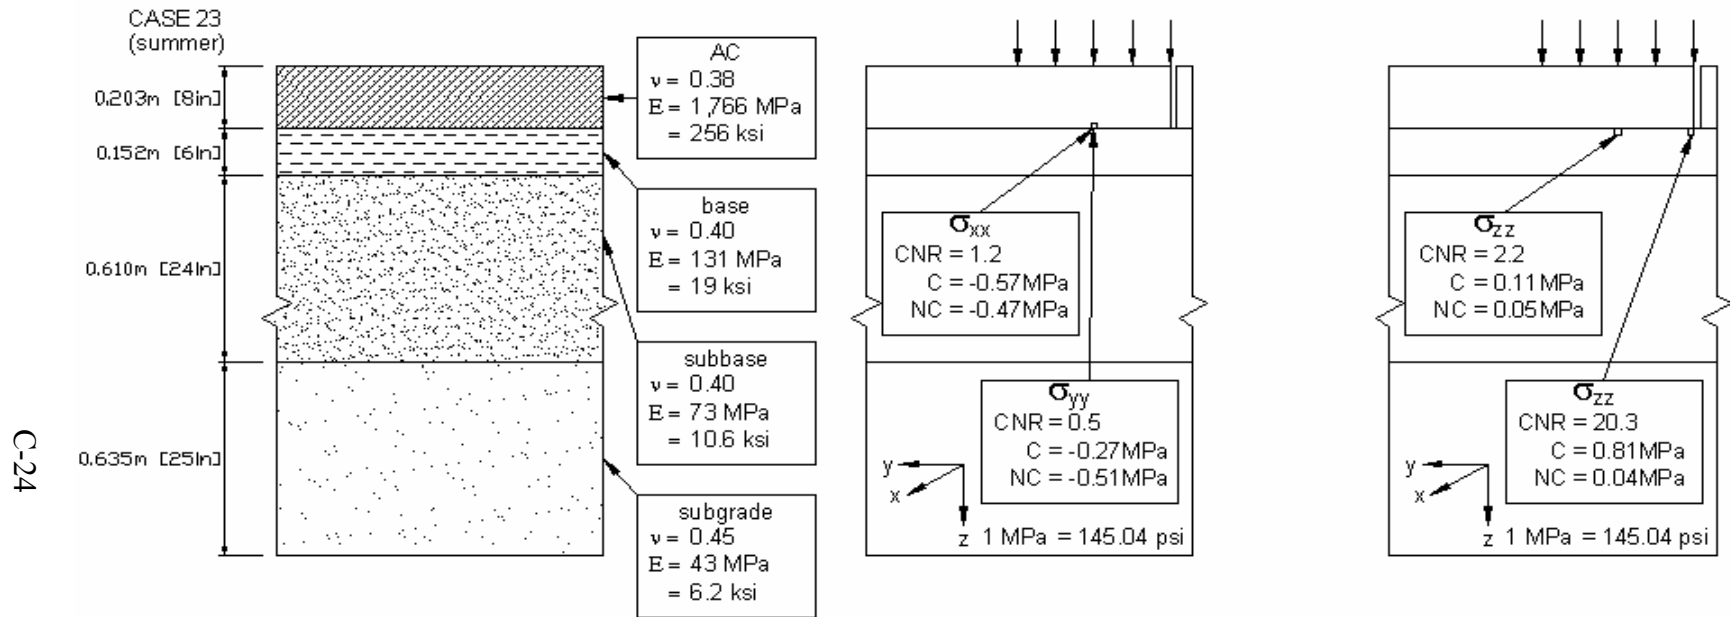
Summary cross section for case 23, (C – stress in cracked pavement, NC – stress in pavement with no crack, CNR – crack/no crack (stress) ratio)
